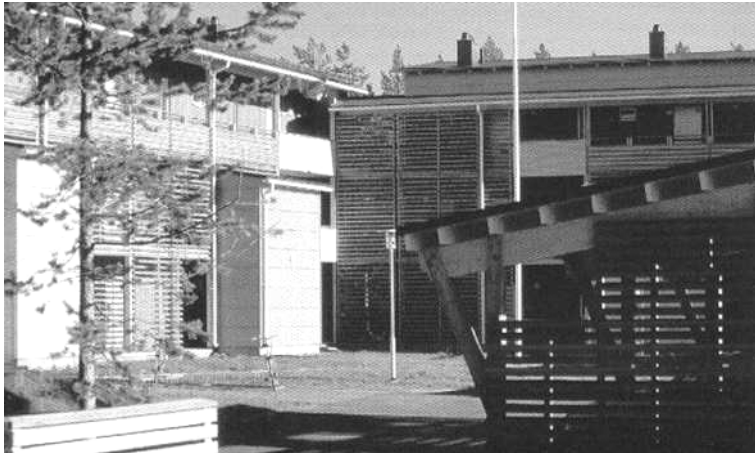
One of Finland's first multi-story timber apartment buildings, Asunto Oy Puukotka, was constructed under the supervision of the Wood Studio of the University of Oulu's Department of Architecture. The experimental site was completed in February 1997.
